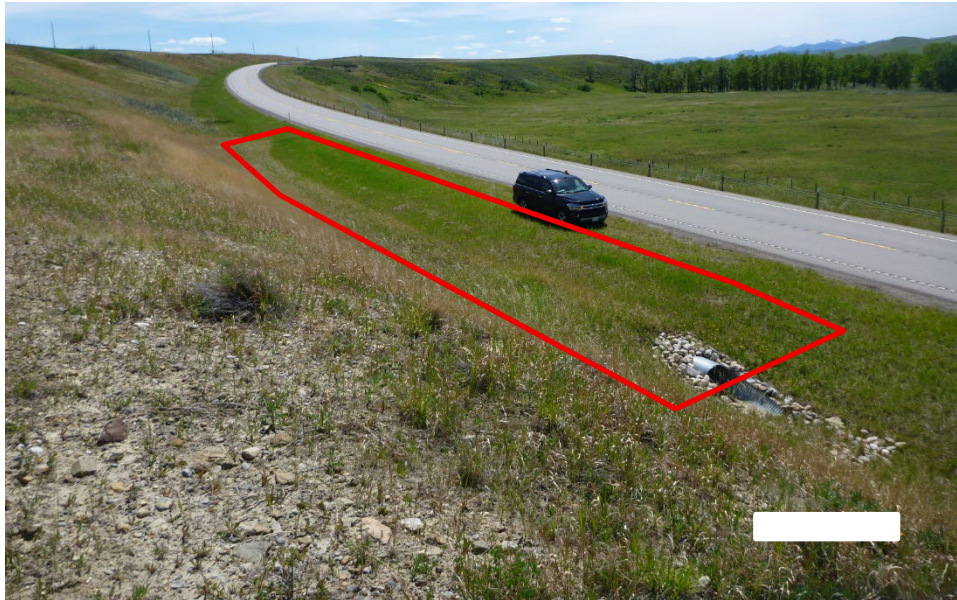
Culvert inlet and riprap apron installed in June 2021. Photo taken May 27, 2025, facing north.
